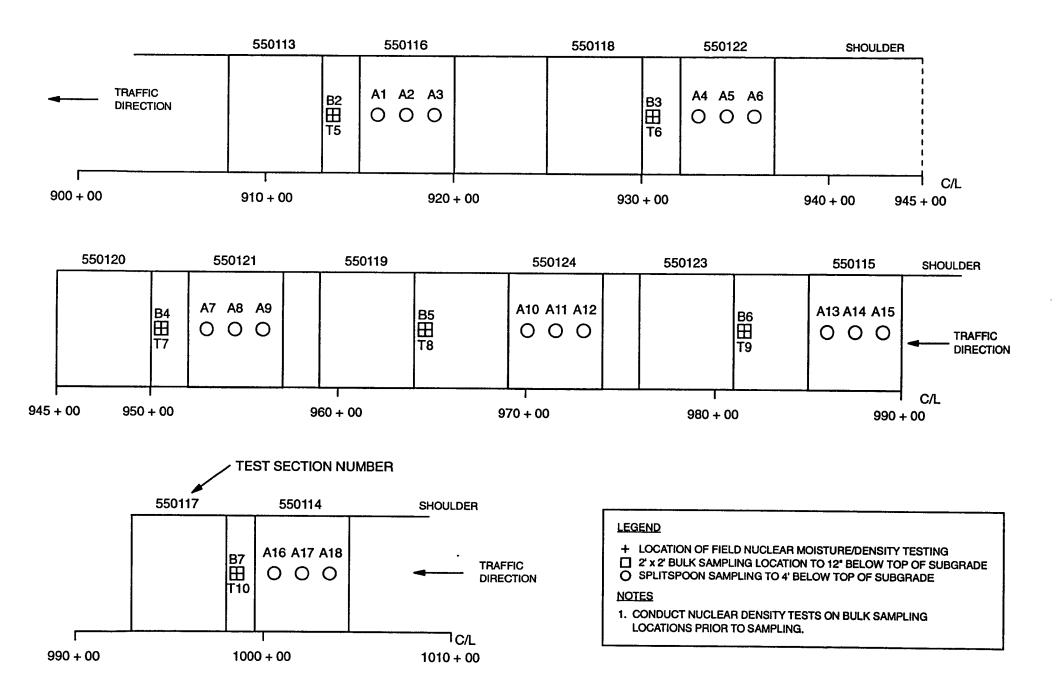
Overview of Sampling and Testing Plan for Subgrade.
